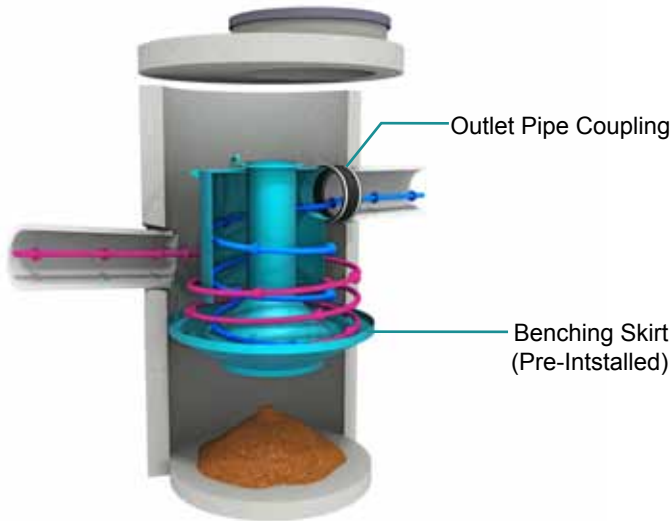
The outlet pipe coupling of the Downstream Defender®.
